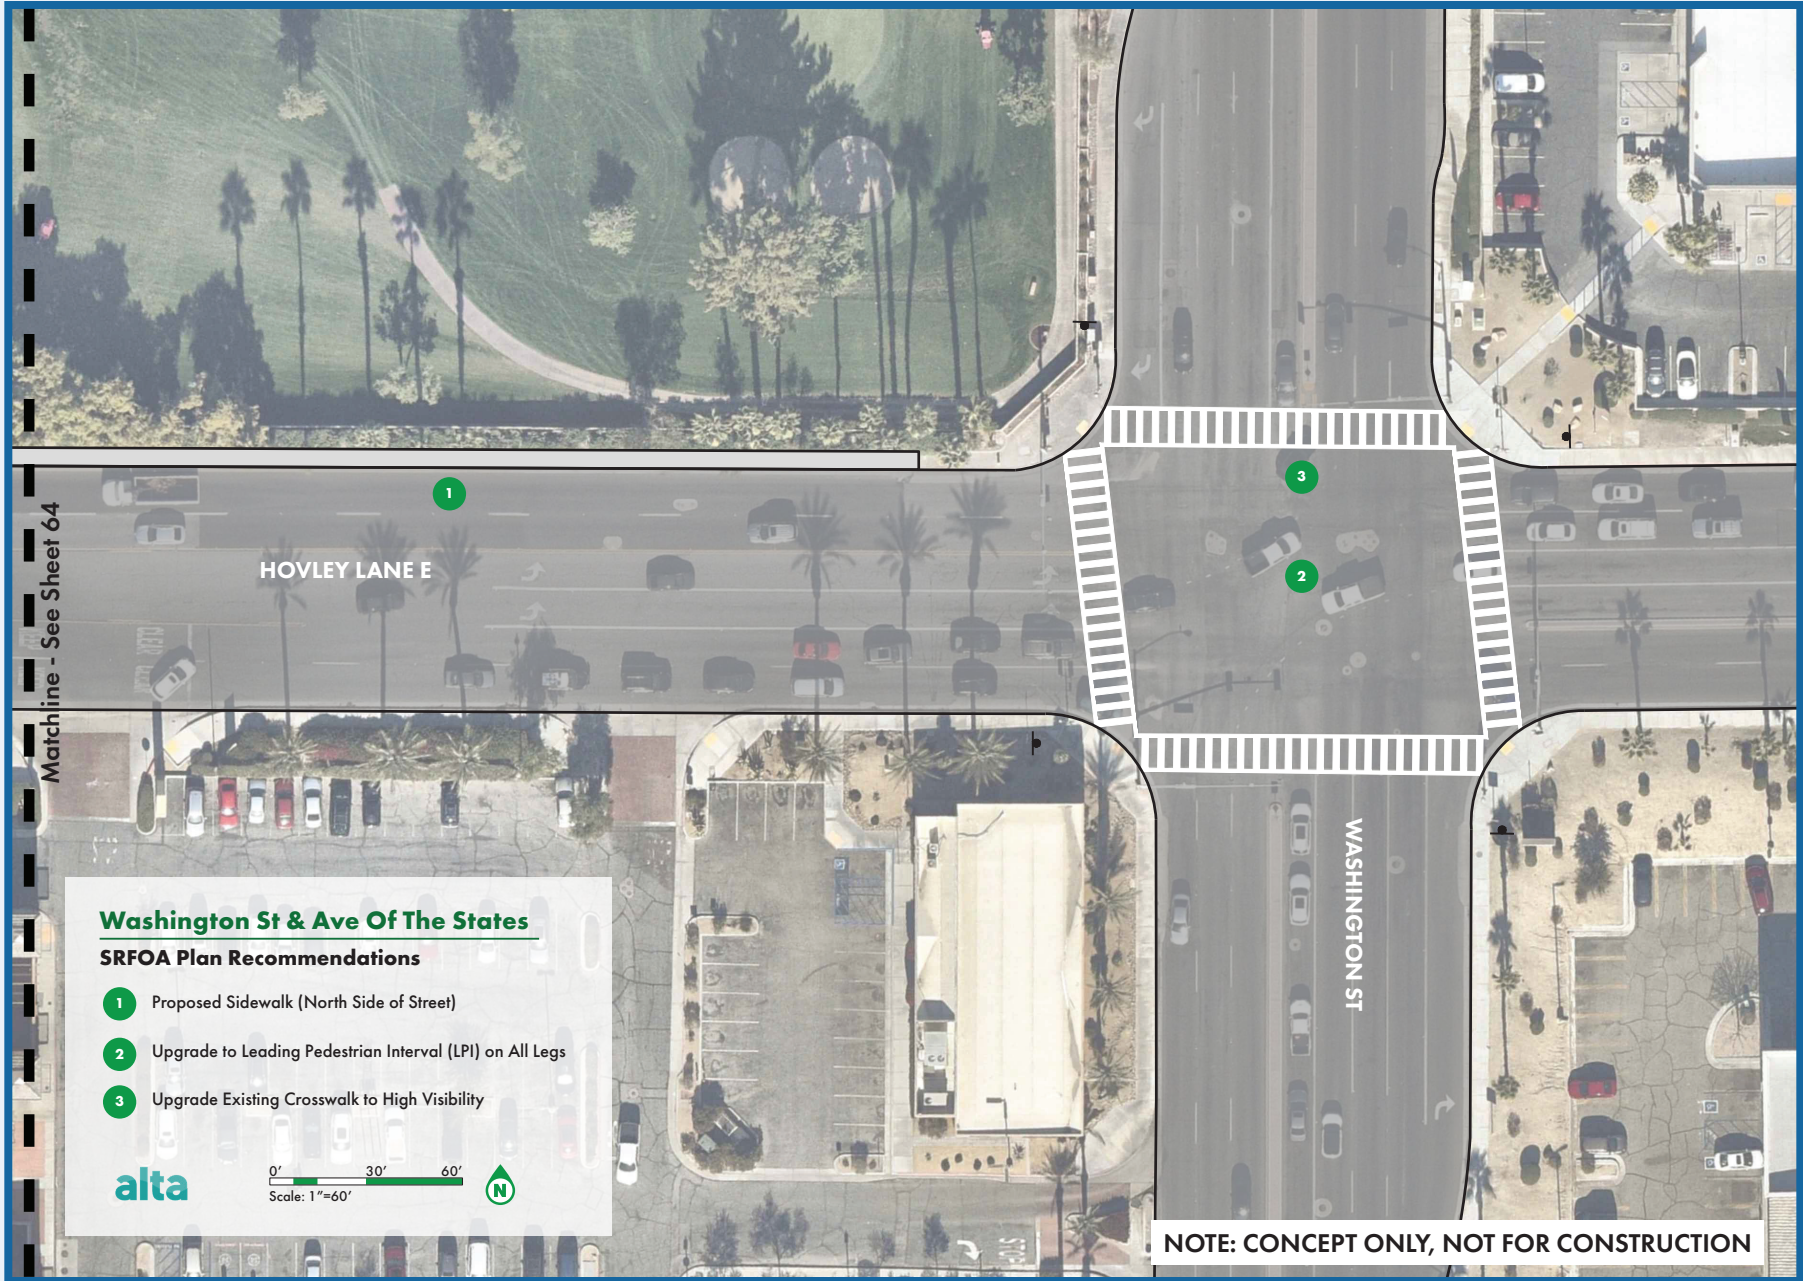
Washington Street / Avenue of the States Concept Plans (7/8)
